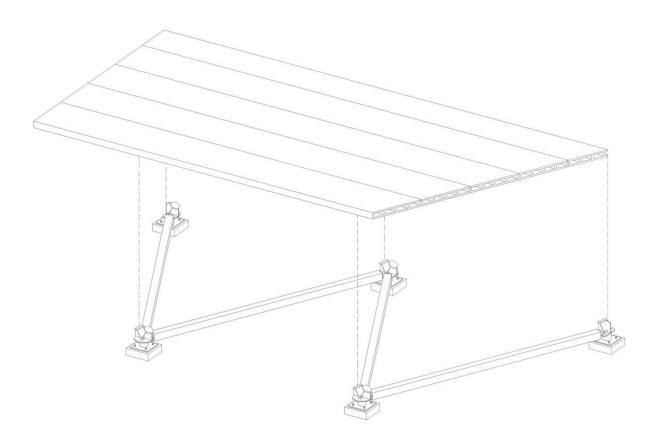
step four, the flooring system (Lignatur) will be placed on the beam
